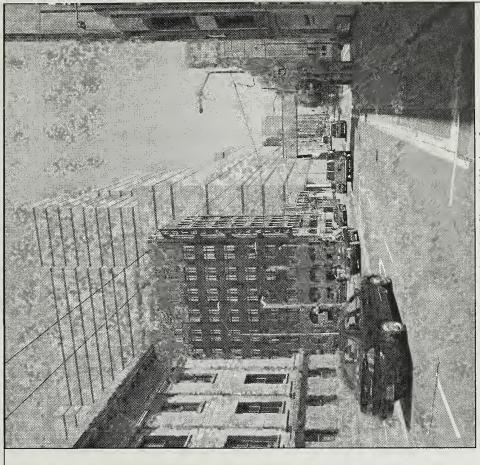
(CONTINUED) VIEW OF PROJECT SITE WEST FROM MISSION STREET EAST OF FOURTH STREET
